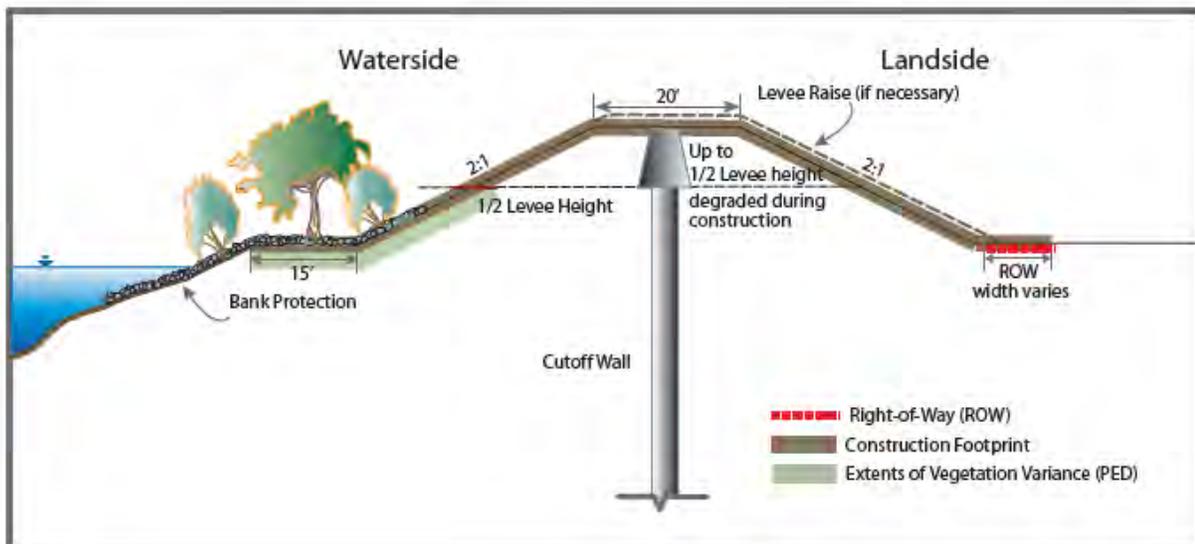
Fix-In-Place with Cutoff Wall and Levee Raise.
